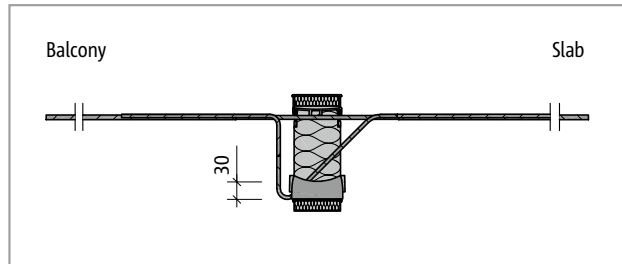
Schöck Isokorb® T type K-M5 to M6: Cross section of the product
